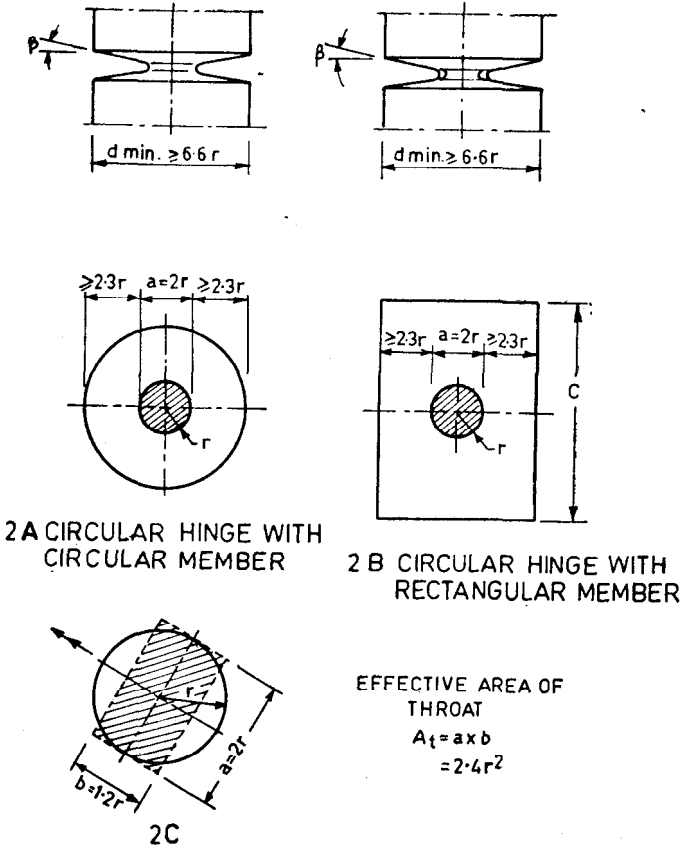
TYPICAL CIRCULAR HINGE — LAYOUT AND SHAPE
